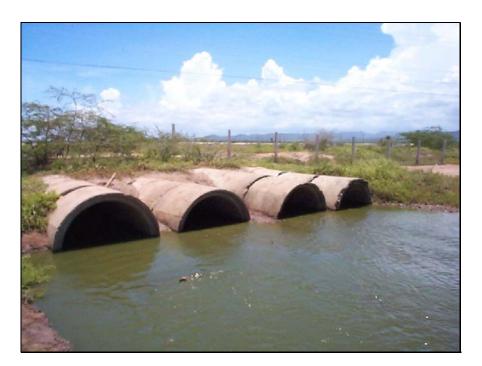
Concrete drainage culverts across Thompson Pen Lane. (Photo taken after clearance of culverts)
